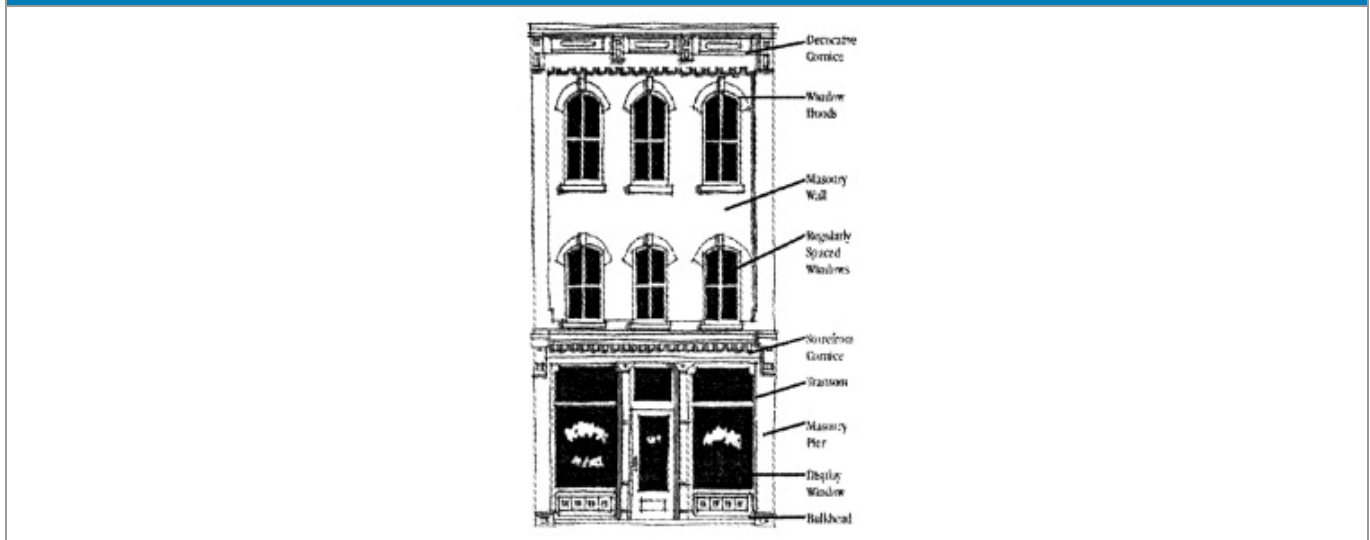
C: EXAMPLE OF STOREFRONT WITH WINDOWS AND DOORS ALONG STREET FRONTAGE
